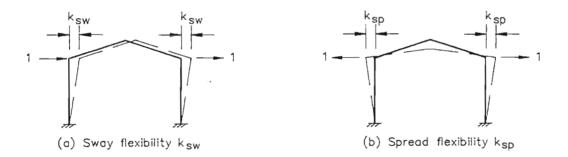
Frame flexibilities for a pitched roof portal frame.
